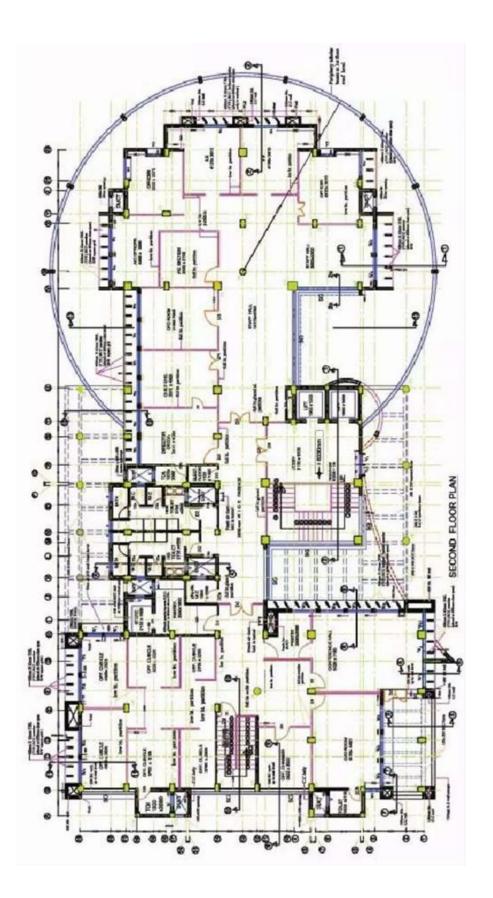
Second Floor Plan - Floor Area – 726.5 Sq.Mts
